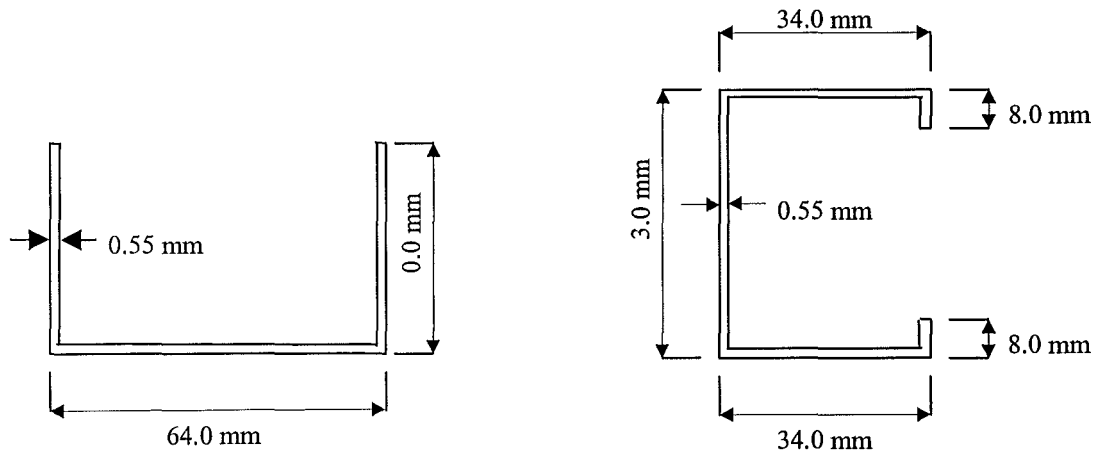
0.55 BMT steel channel and 0.55 BMT steel stud sections.
